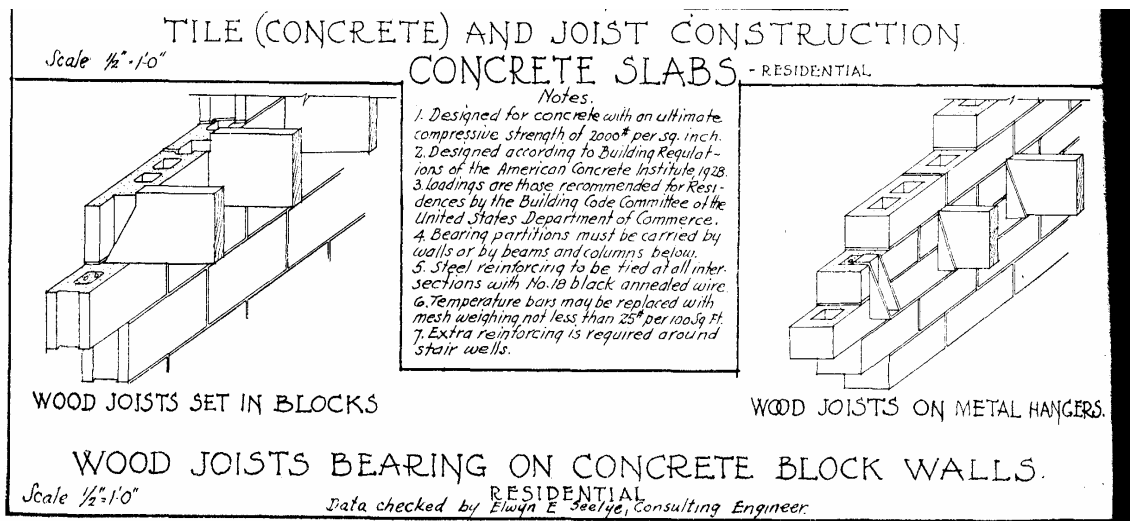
Images of joist-masonry wall connection from the 1932 edition of *Architectural Graphic Standards*.
